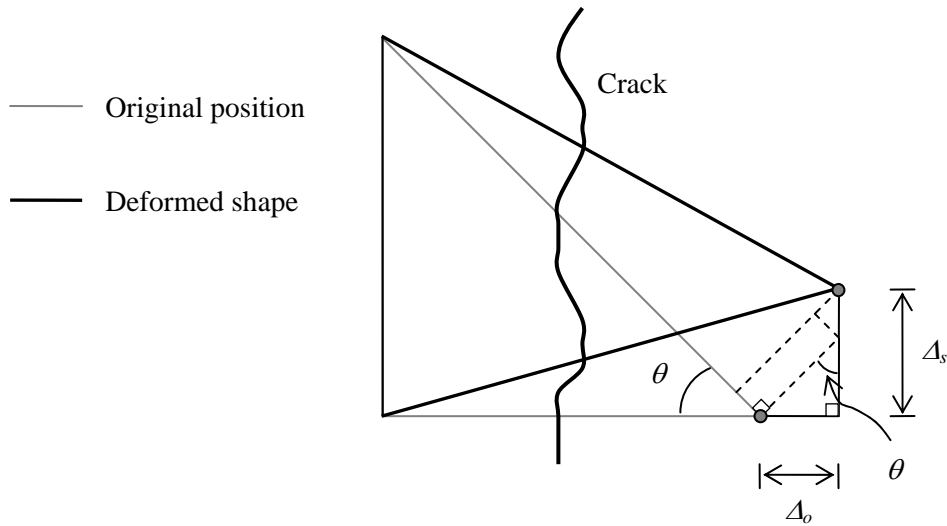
Deformation of floor slab calculated from potentiometers with triangular arrangement
